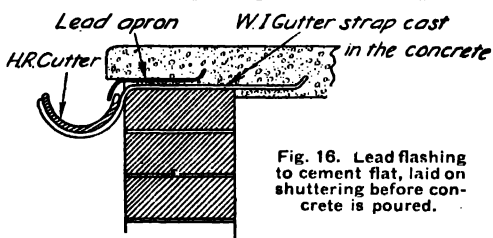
Lead flashing to cement flat, laid on shuttering before concrete is poured.
